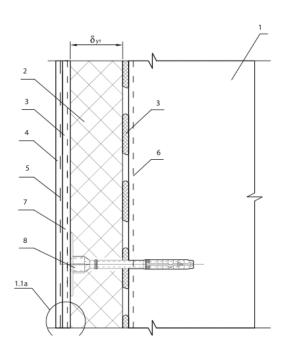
Schematic diagram of wall insulation with reinforced fixing with dowels
